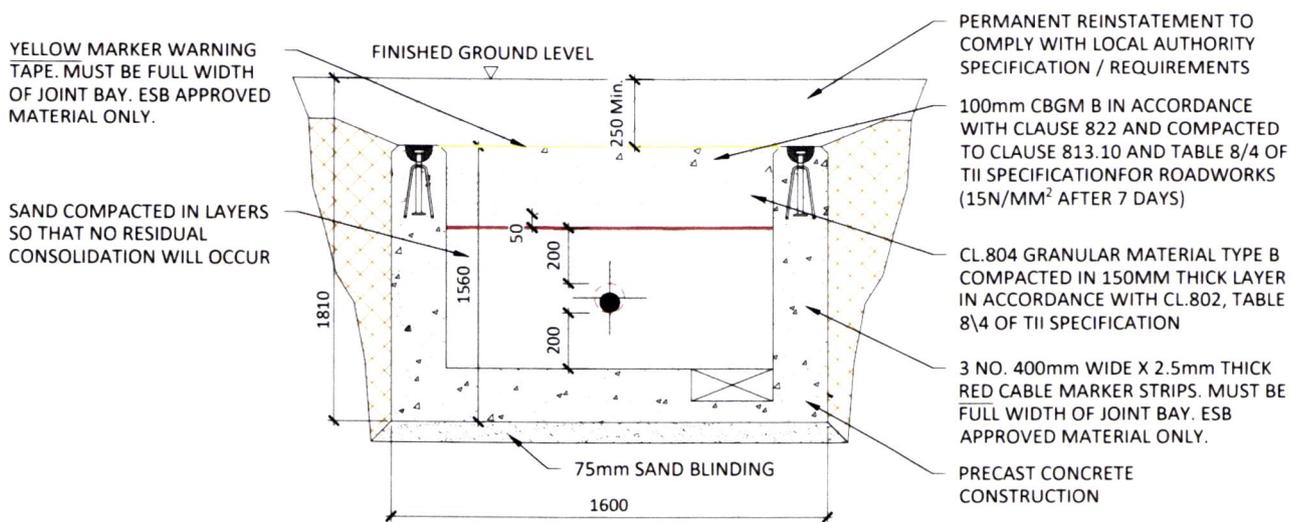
Typical Elevation of Joint Bay installed in Roadway
